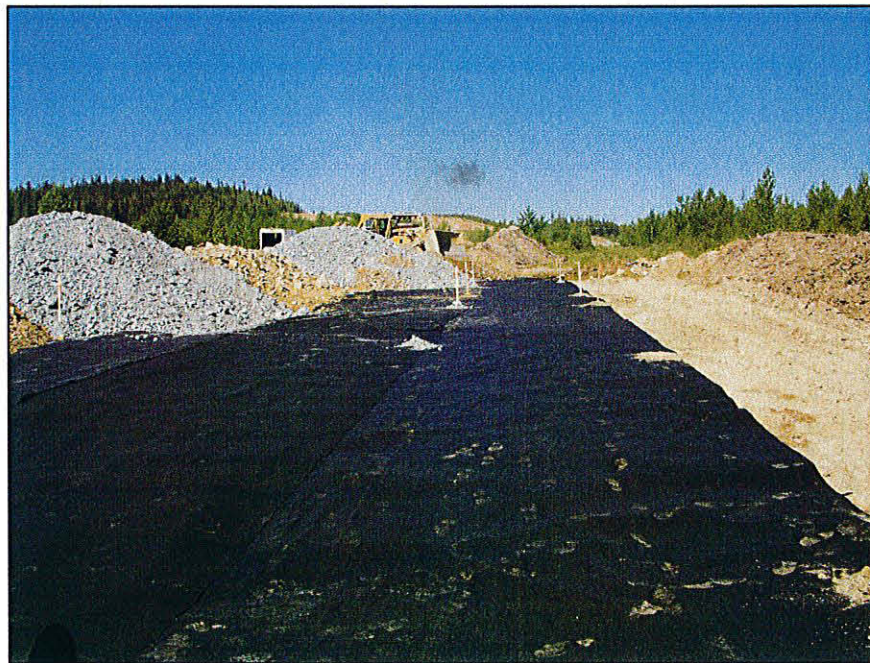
Mount Polley Mine Site. Tailings Storage Facility in the foreground.
